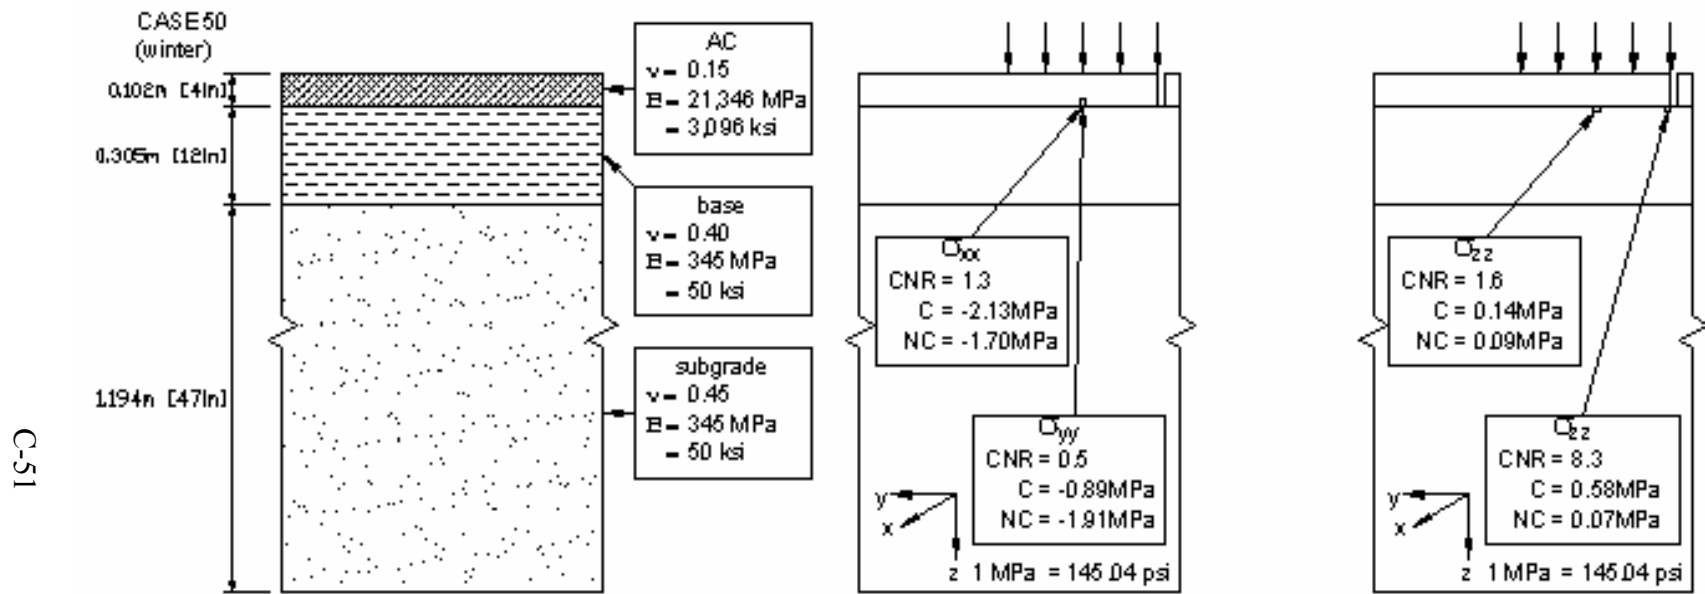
Summary cross section for case 50, (C – stress in cracked pavement, NC – stress in pavement with no crack, CNR – crack/no crack (stress) ratio)
